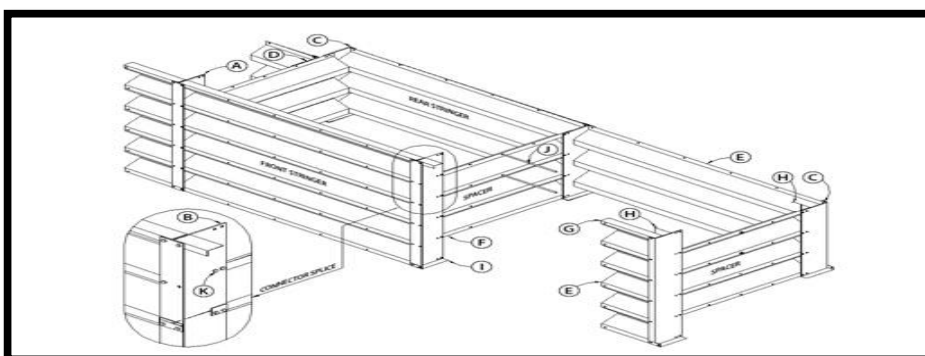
Steel bin wall. (<http://www.aill.ca/>)
